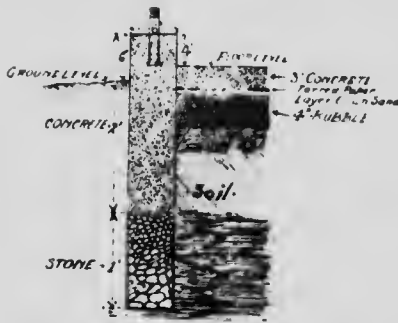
Showing construction of the foundation wall and floor of poultry houses.
